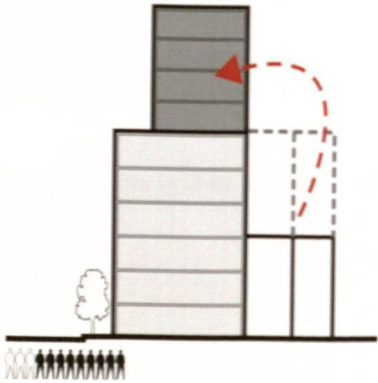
“There developers proposed modest cantilevering the new floors.”
